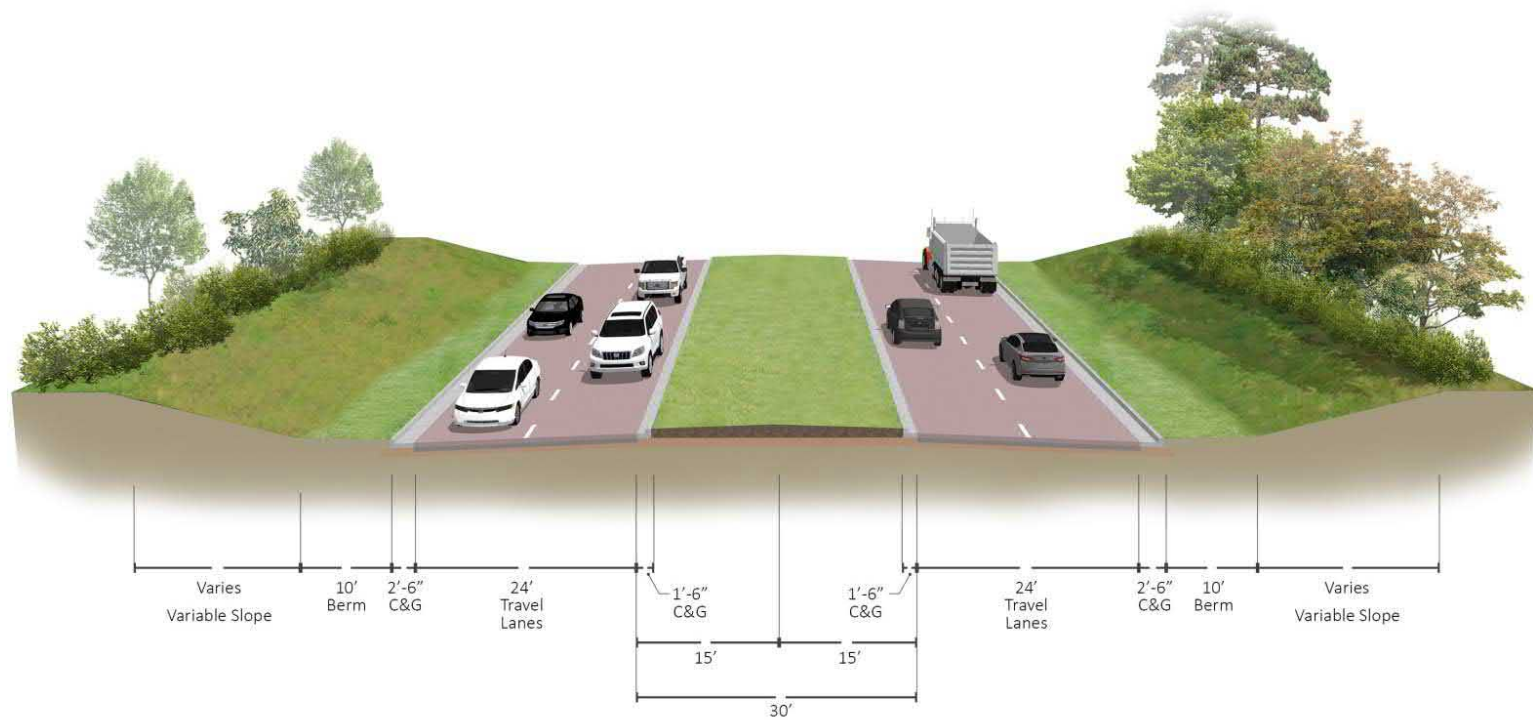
Current Detailed Study Alternatives Typical Section – four-lane arterial widening
